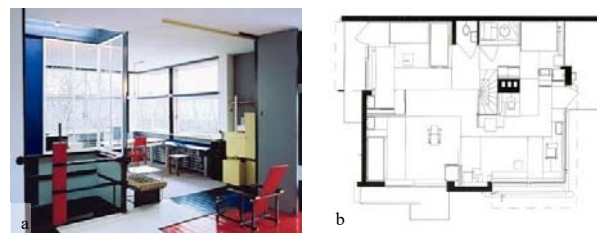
(a) The Schroder House flexible interior space (b) The house’s open plan
